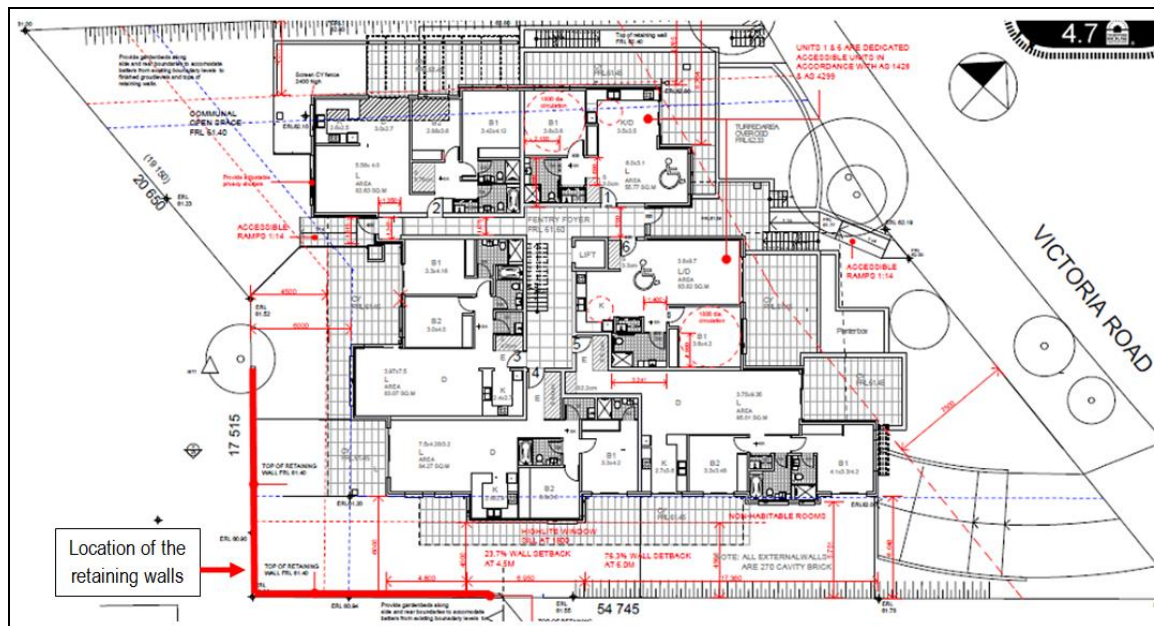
Location of retaining walls. The height of the wall will be a maximum of 0.5m.
